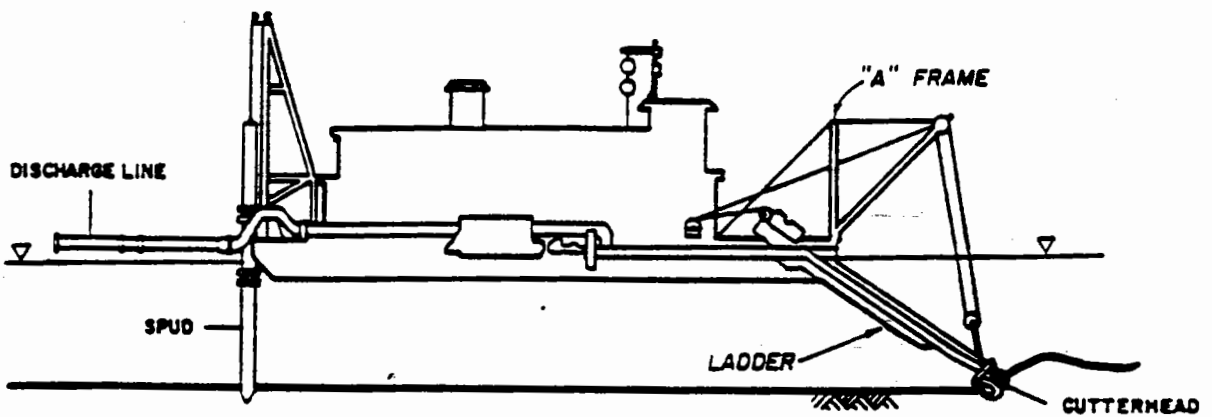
Hydraulic Pipeline Cutterhead Dredge
